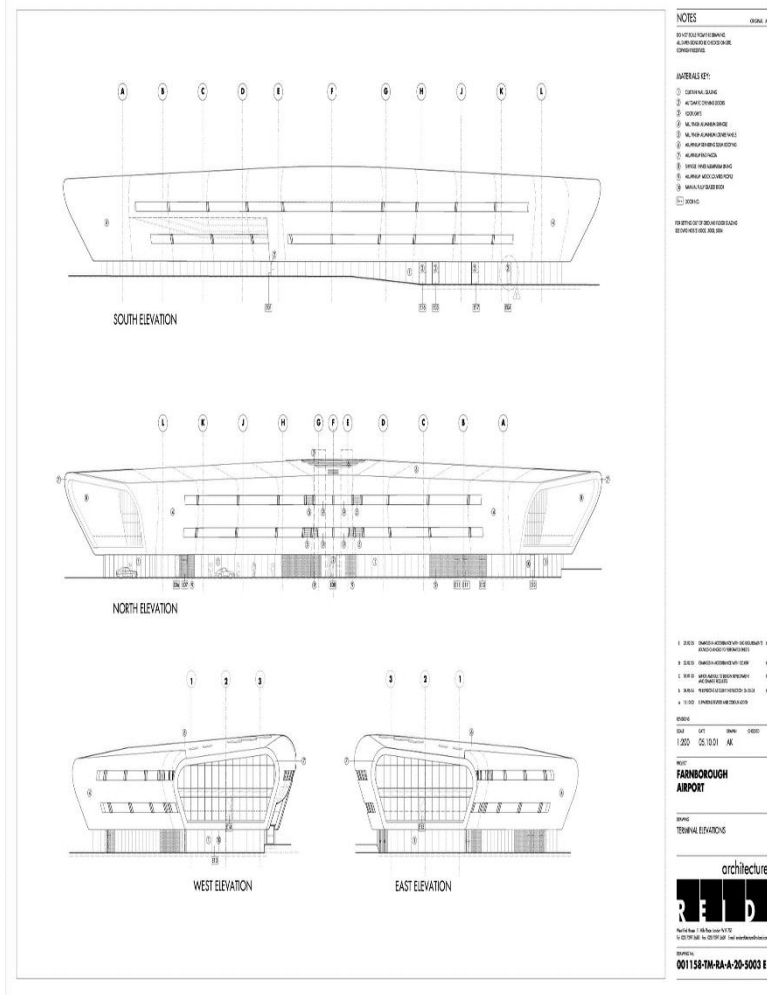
4: TAG Farnborough Airport Terminal Building Elevations
